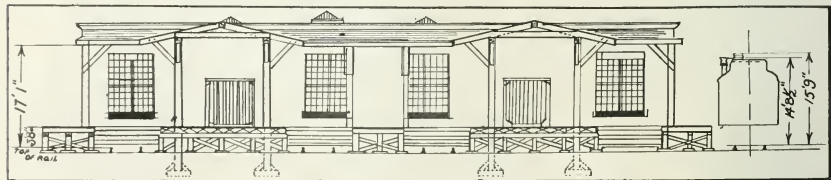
Cross section, car cleaning building and shelters, C.P.R. Glen Yard, Montreal.
